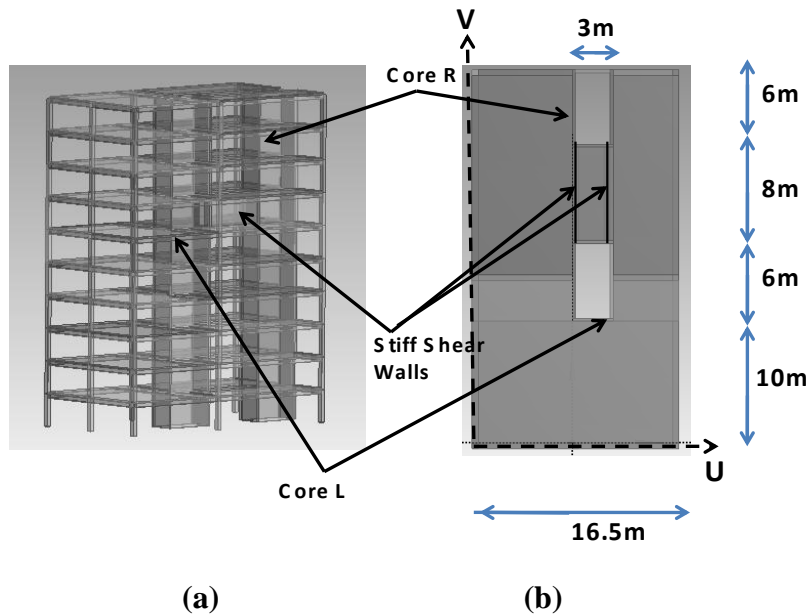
Structural framing system (a)- isometric view and (b)- plan view
